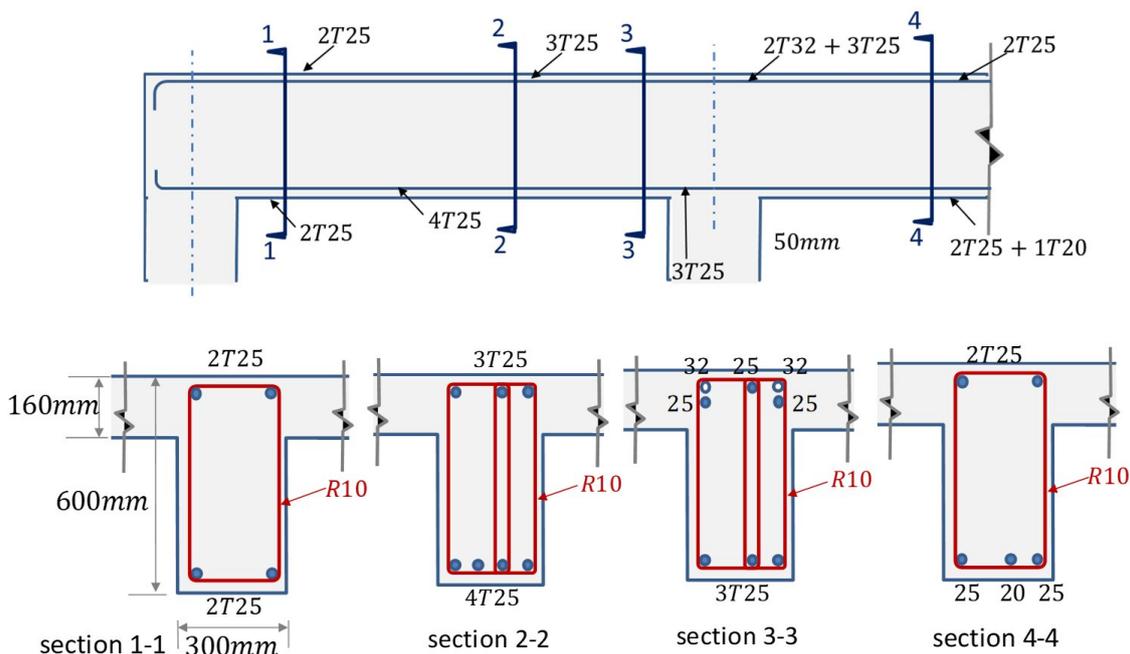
Longitudinal reinforcement along the beam and placement of longitudinal and shear reinforcement within the cross section.
